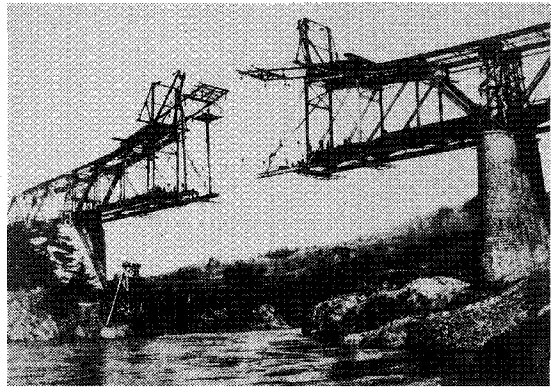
Construction of Aganogawa - Kamanowaki Bridge (Completed in 1913)
